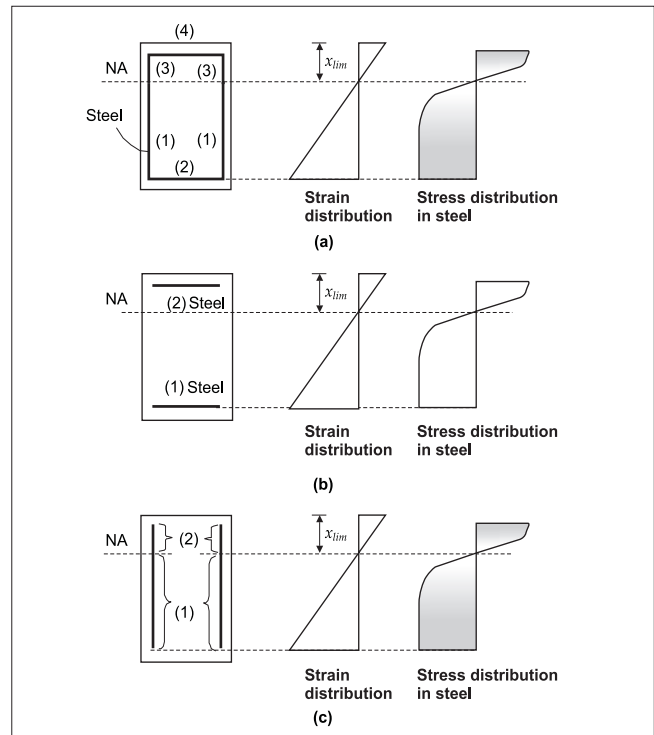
Calculation of forces in steel with (a) Case A: reinforcement on four sides, (b) Case B: reinforcement on two faces along width (c) Case C: reinforcement on two faces along depth
